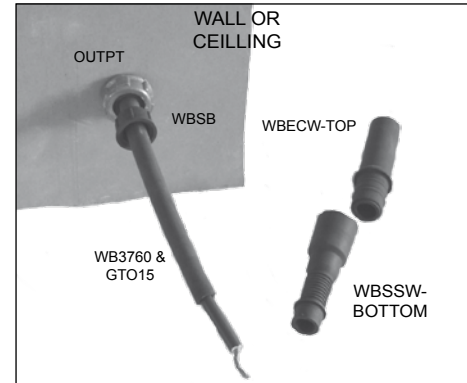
Slide WBSB over GTO cable and WB3760 sleeving assembly.
